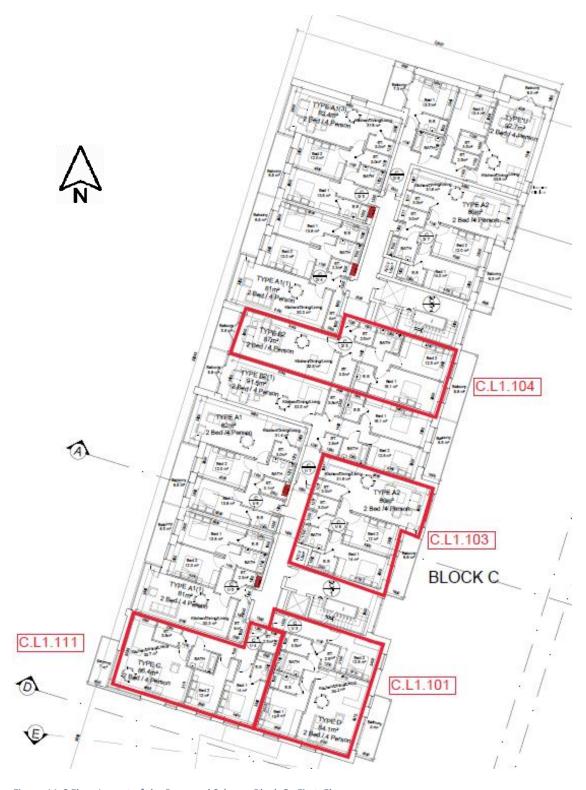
Floor Layout of the Proposed Scheme Block C— First Floor
